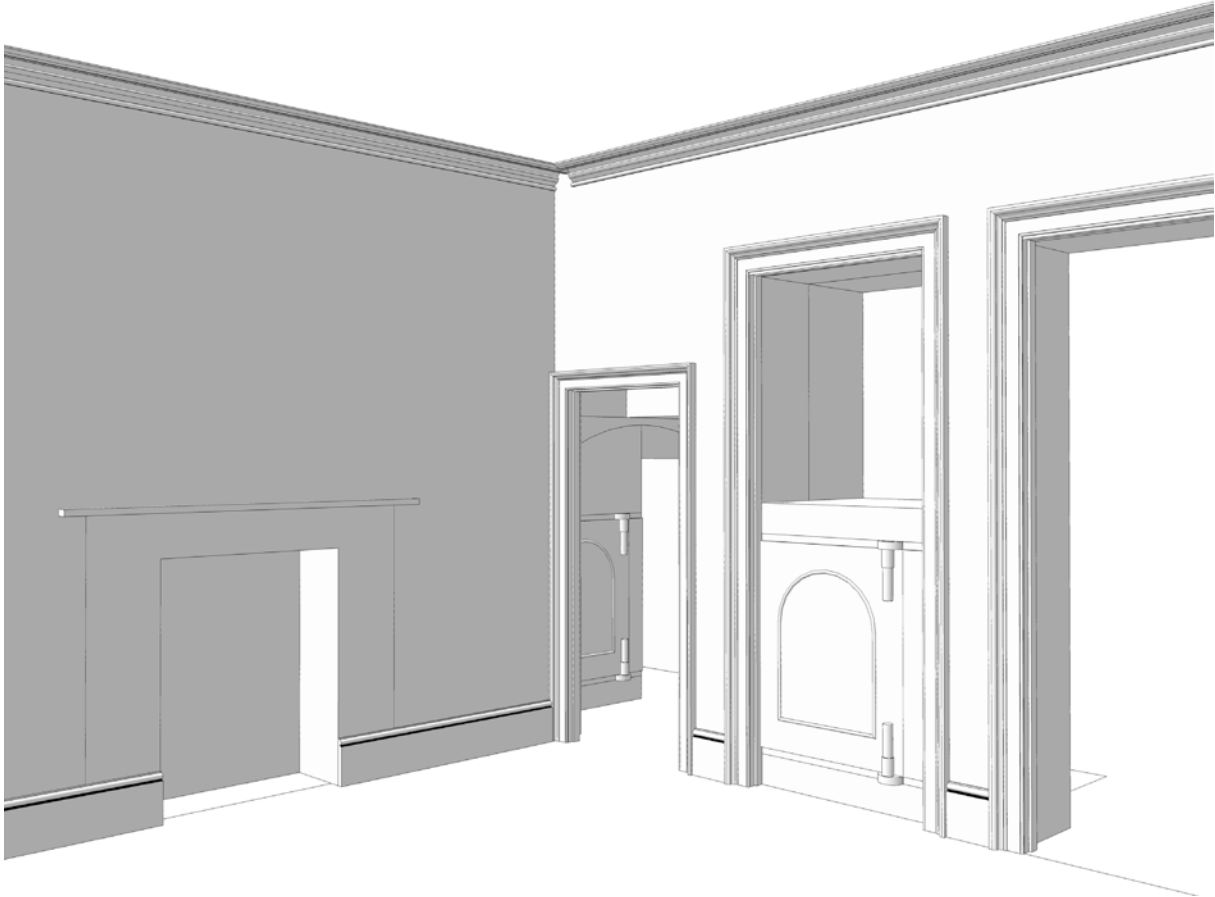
South office, south room - ground floor, showing safes in 'cupboard' and alcove under the stairs.
